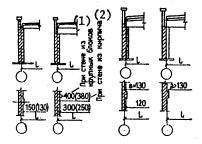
Tie-in of the outside bearing walls made of large blocks and brick to the longitudinal modular center lines of buildings
